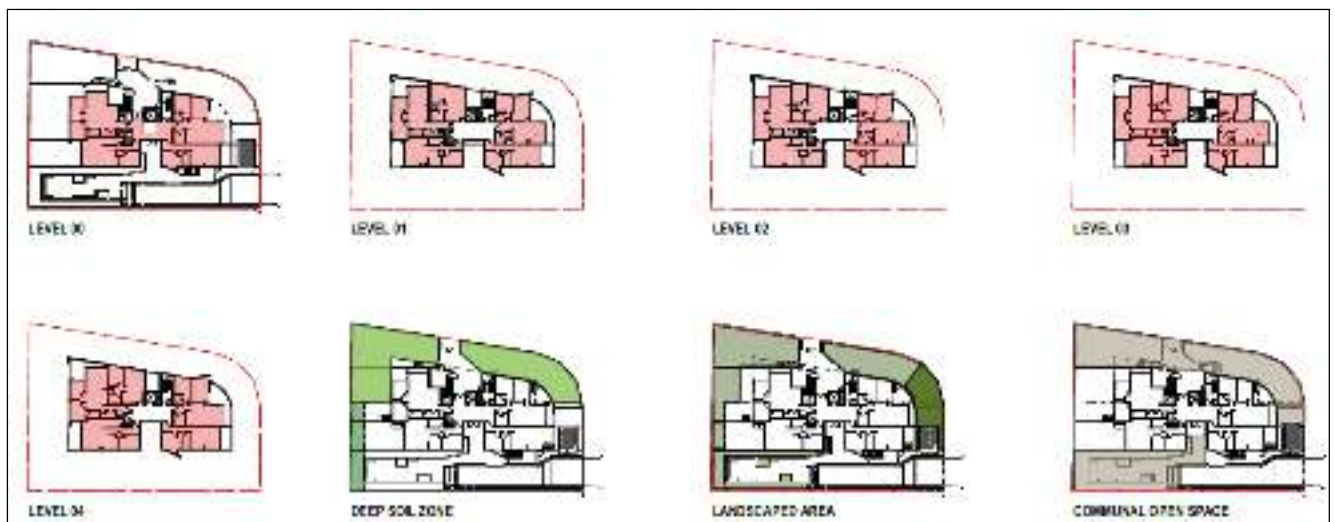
Typical floor plan showing the corridor lobby area excluded in the GFA calculation (in red circle). The shaded areas indicate GFA at residential floor levels 1-4. (Source: DA27-A prepared by Kennedy Associates Architects)
